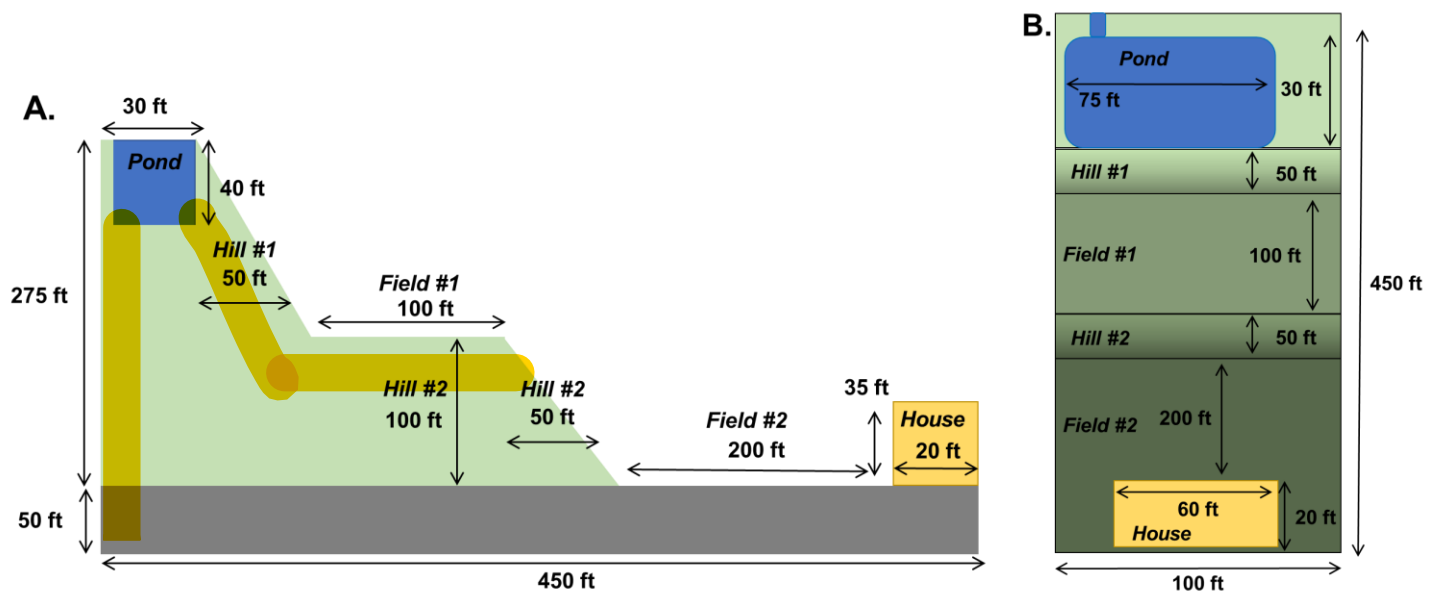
Schematic of design area, showing the house and pond, as well as relevant landscaping features. A) Elevation view and B) area (plan) view.
